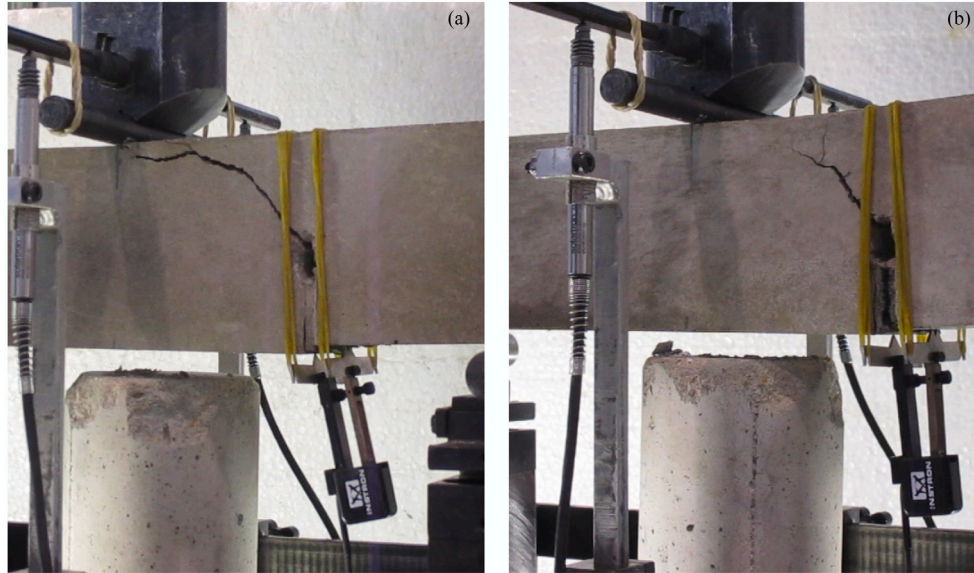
Three-point bending test in self-compacting concrete: (a) detail of cracking without steel fiber reinforcement; (b) detail of cracking with the maximum steel fiber reinforcement content ($\phi_f = 0.6\%$).
